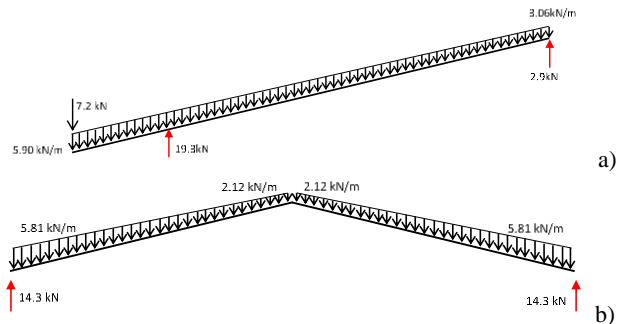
Static equilibrium of roof structures: a) external beam; b) central beam.
